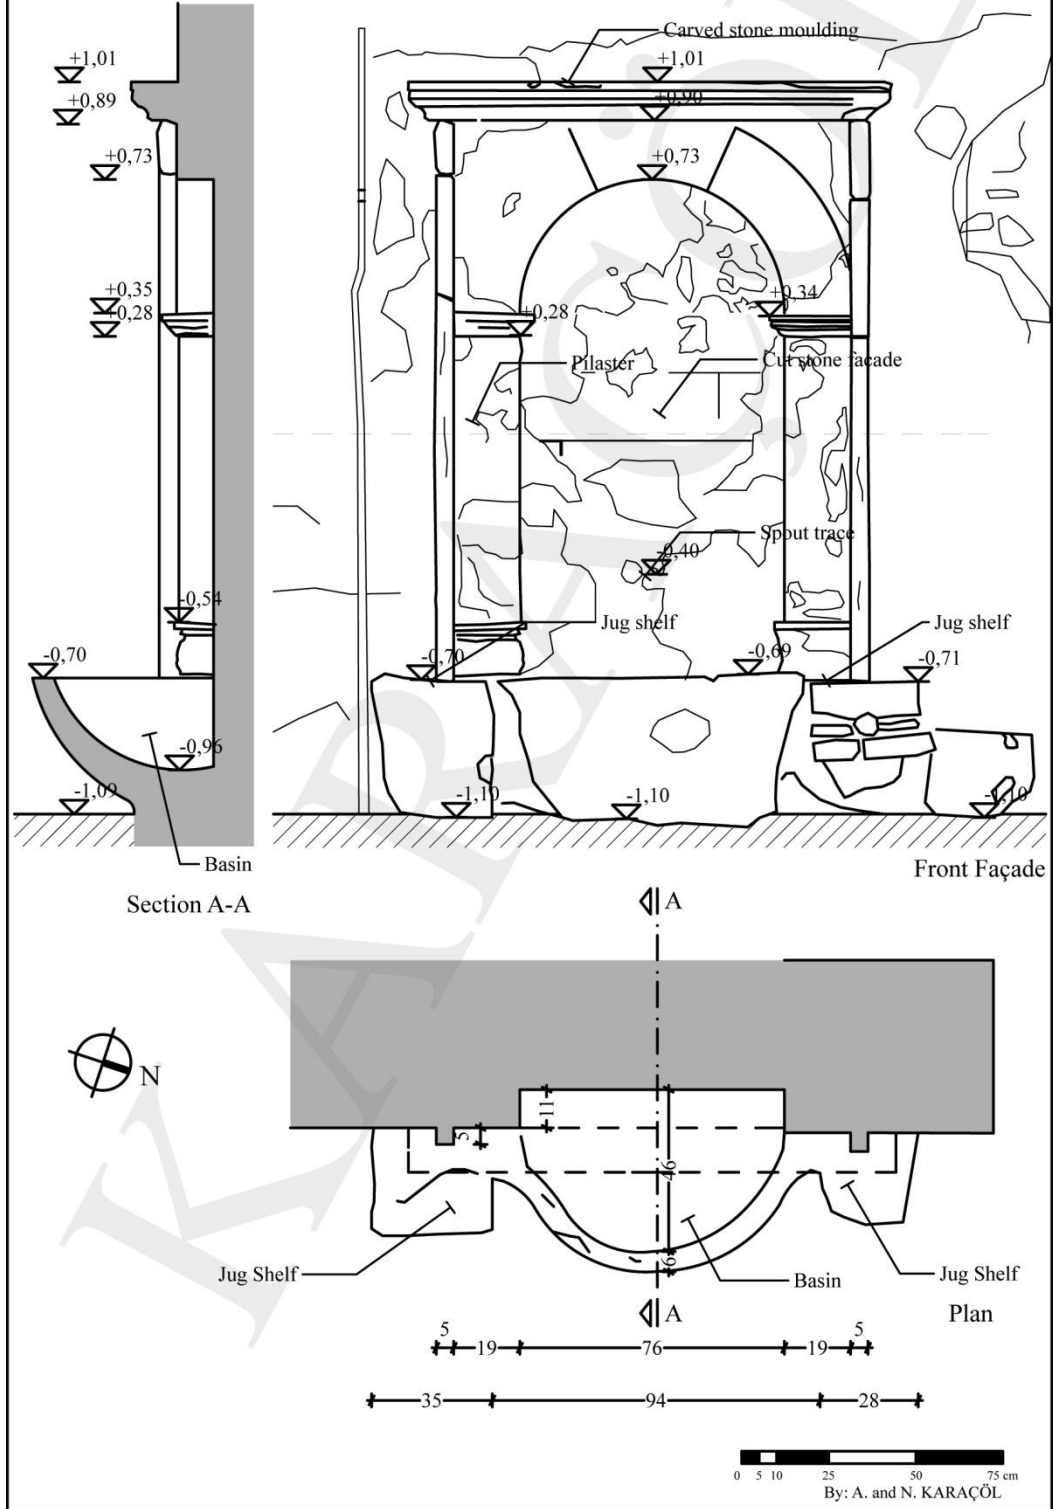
242 land 7 parcel house fountain section, front façade and plan drawings
